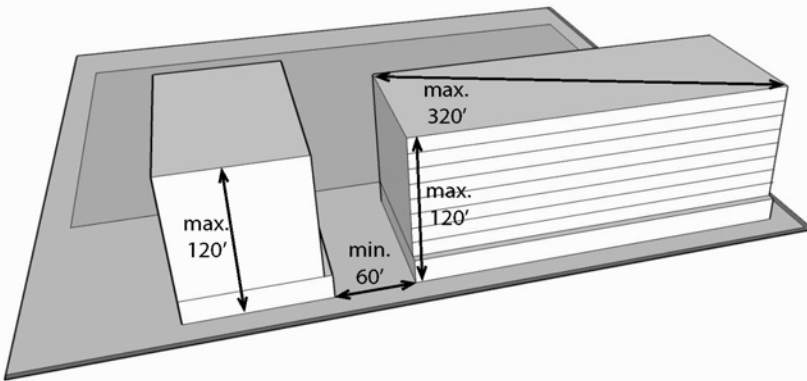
Height, Bulk and Spacing for Buildings 65’ to 120’ High
